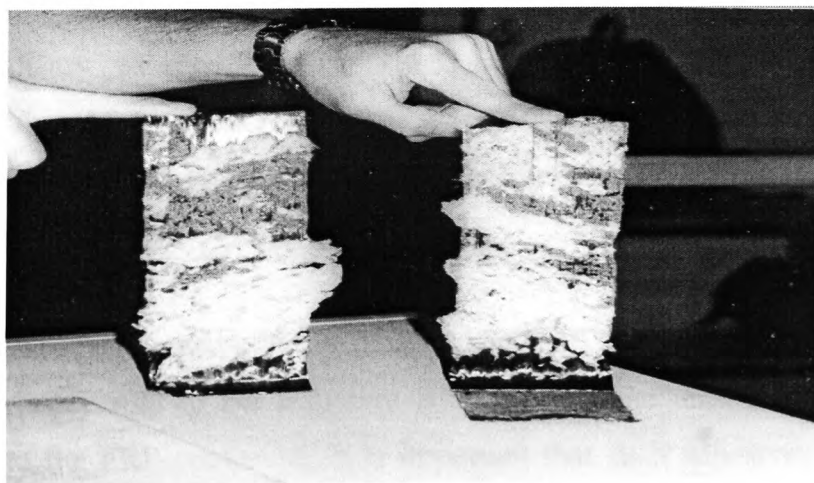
Failure mode of U-shaped CFRP Wrapping Strips (Beam B2)
